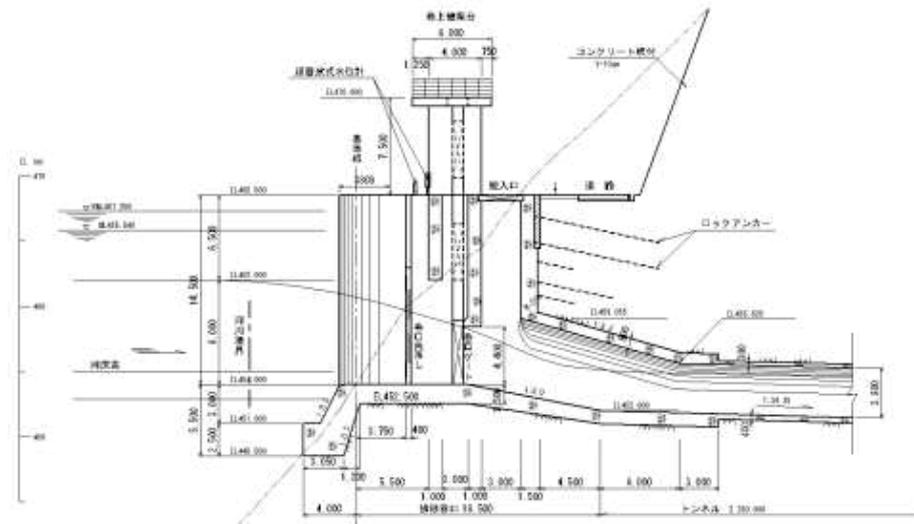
Vertical cross-sectional view of the intake part of the bypass tunnel
